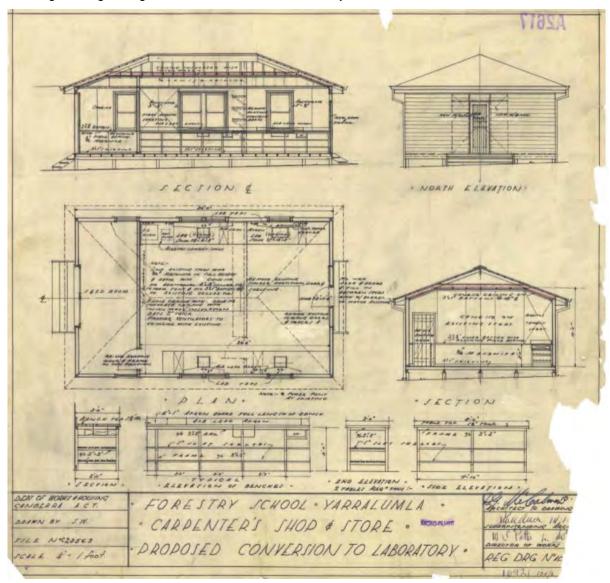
Proposed plans for conversion of Carpenter's Shop into Seed Store and Laboratory (nd) (NAA # 7499489)
